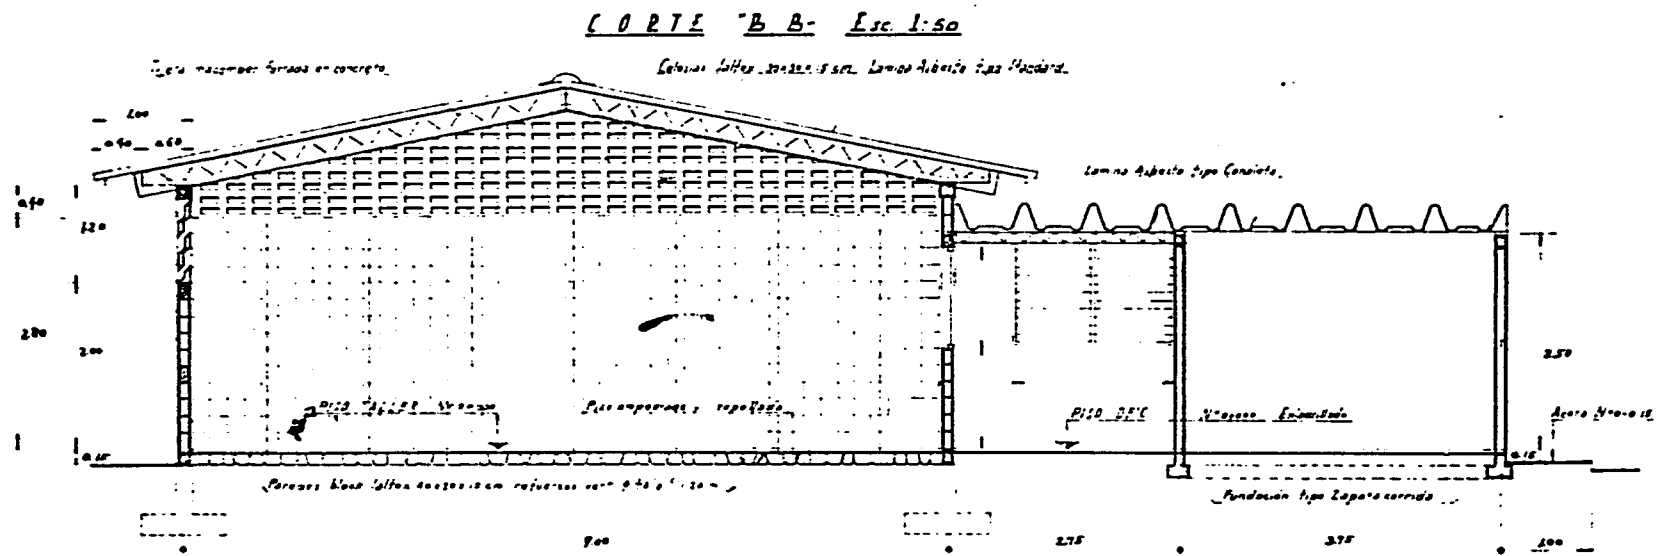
LEFT ELEVATION (B) OF WAREHOUSE, GARAGE AND SHOP BUILDING
